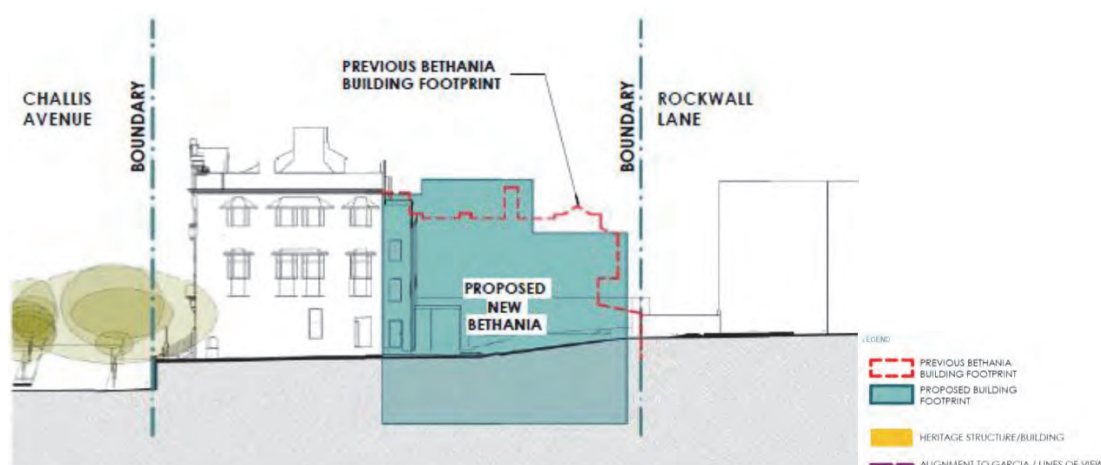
Section of the proposed Masterplan along Rockwall Lane
